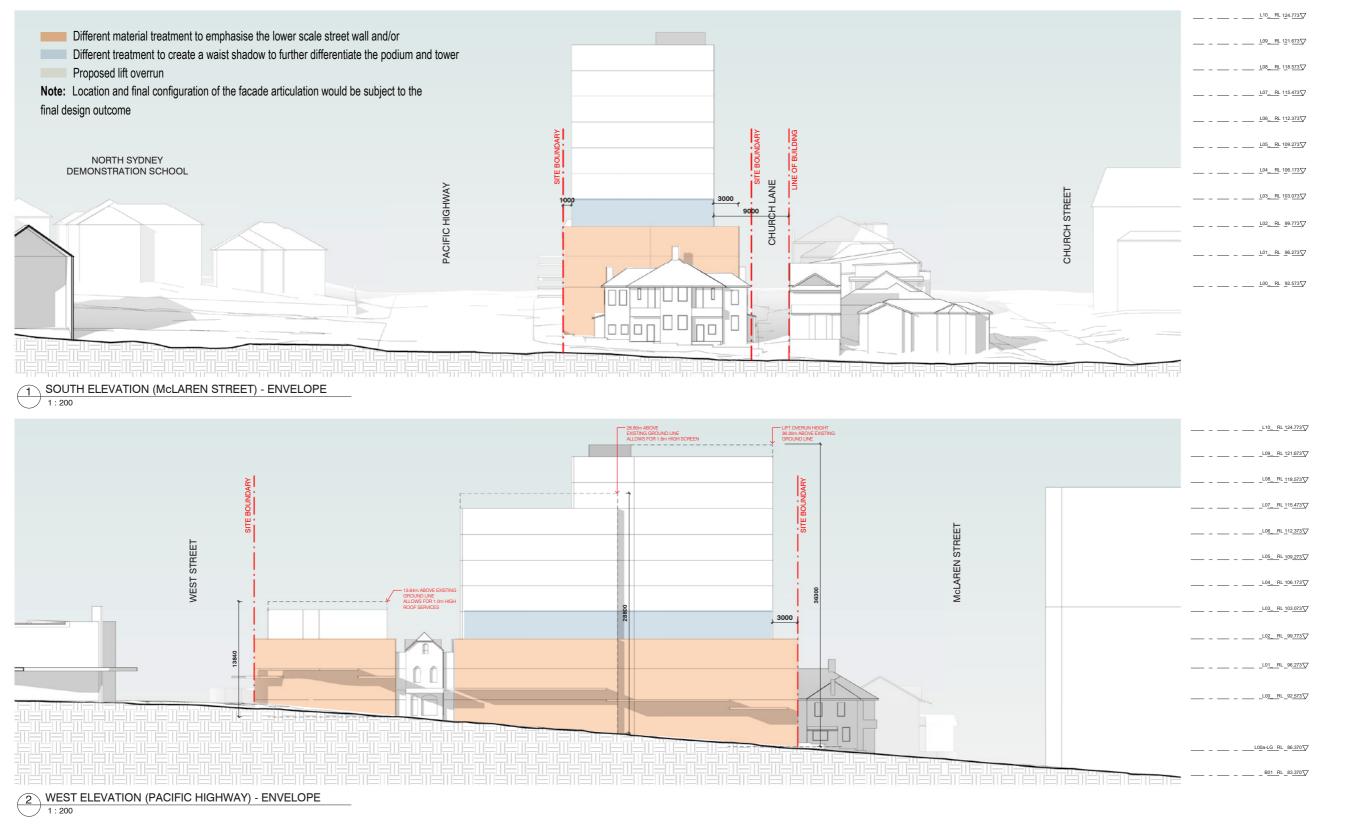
Indicative elevations (adopted from PTW Building Envelope Study and Reference Design).
